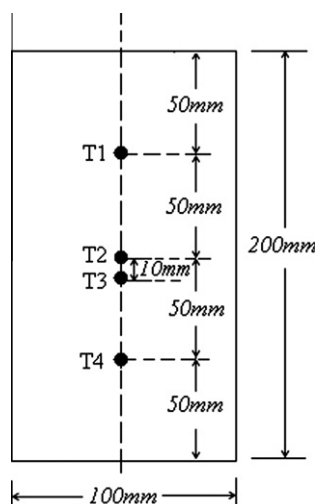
Typical 100×200 mm cylinder specimen with thermocouples arrangement.
